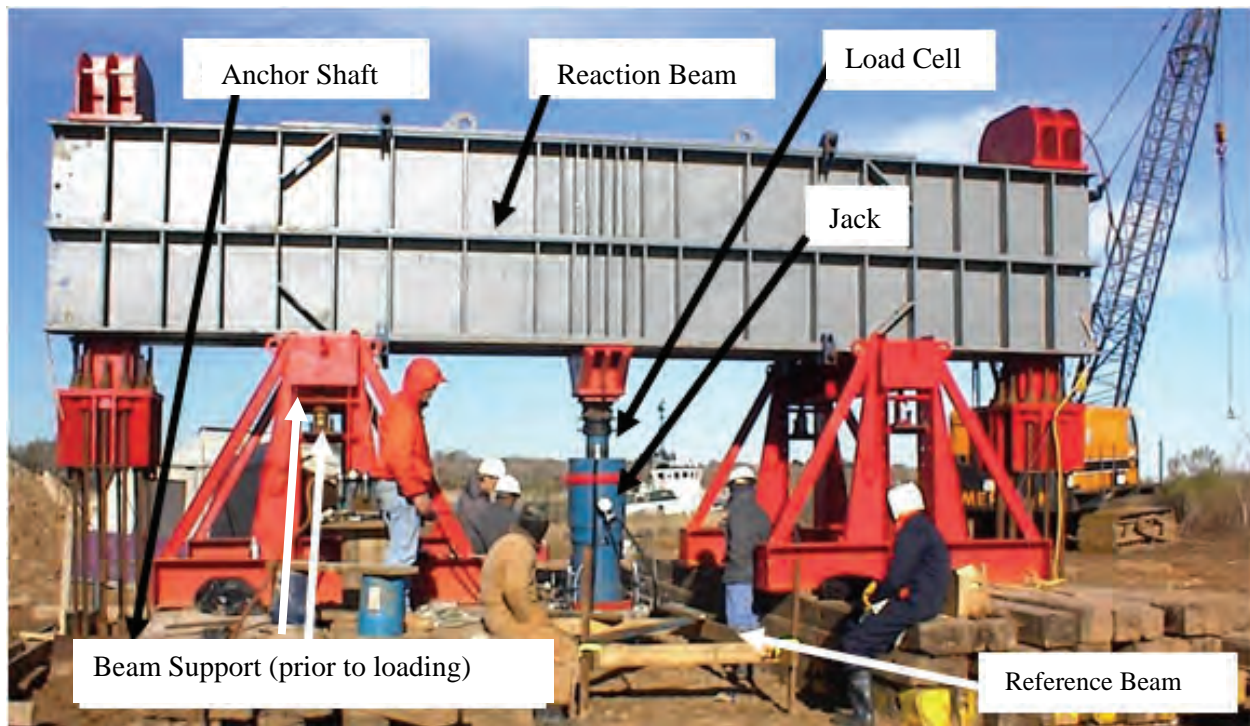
Conventional Static Load Test on a Drilled Shaft (photo courtesy Bill Isenhower)
